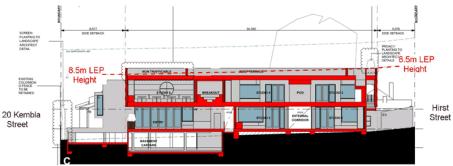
Section showing height of building & maximum 8.5m LEP Height
